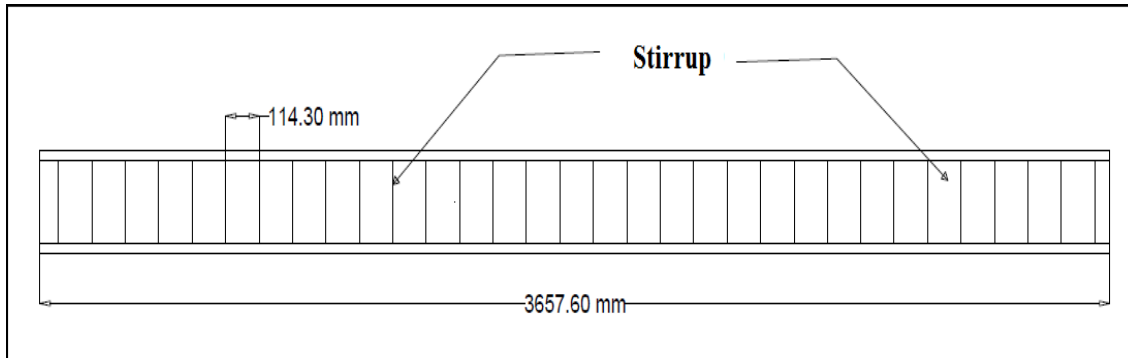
Stirrup detail for post-tensioned concrete beams (Kim, U., et al. 2010,)
